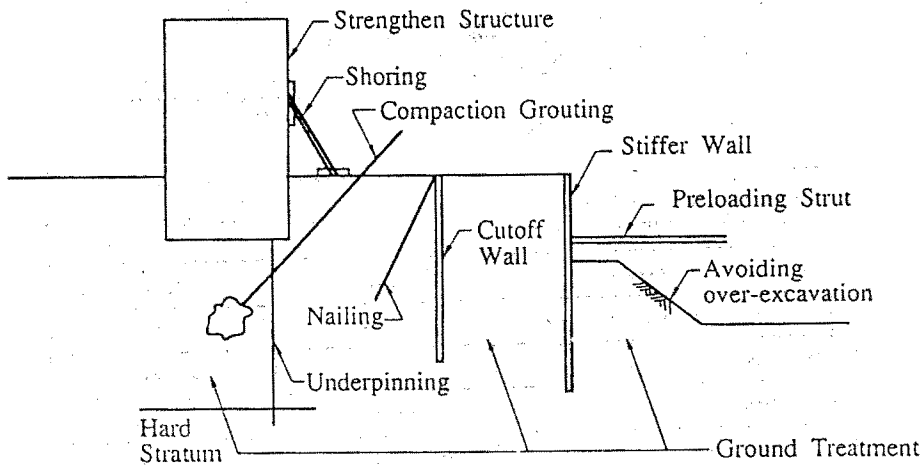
Concept of Building Protection (after Wong et al., 1993)
